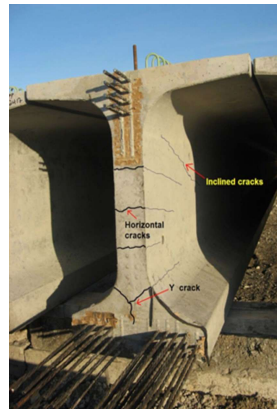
Inclined and Horizontal End Cracking on Girder (Photograph by Concrete Bridge Views)
